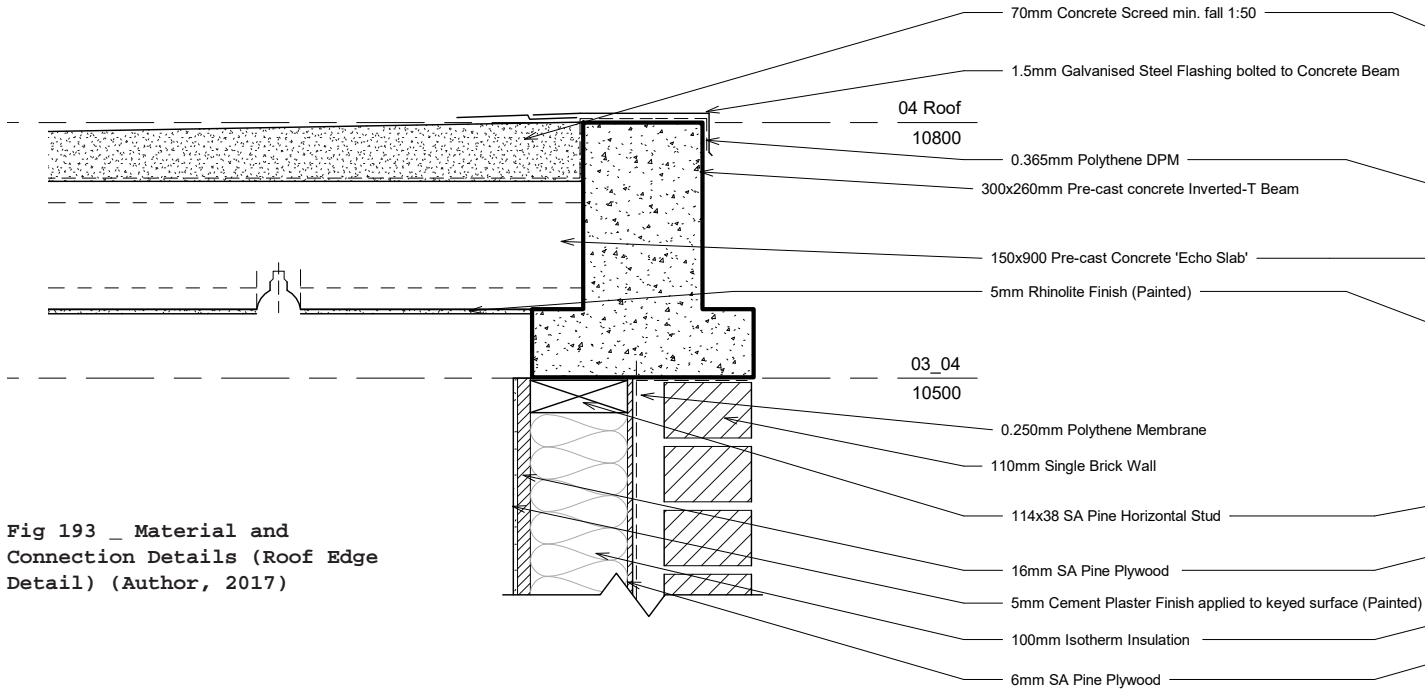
Material and Connection Details (Roof Edge Detail) (Author, 2017)
